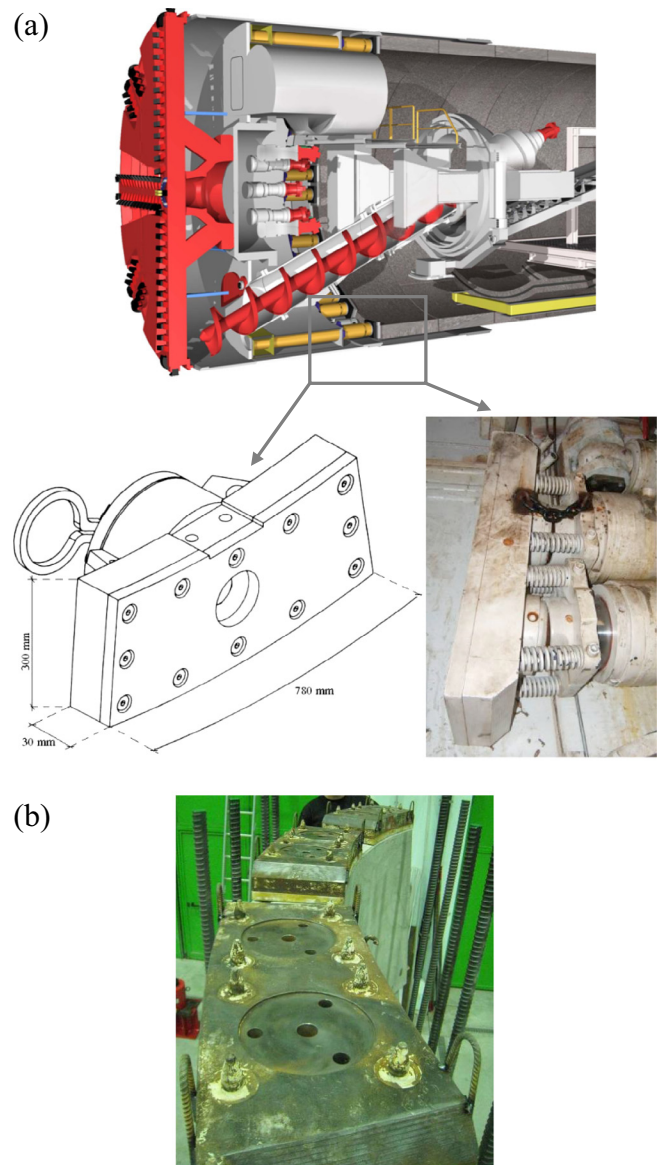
Transversal section of TBM with shoe detailing (a) in situ; (b) in Lab.
